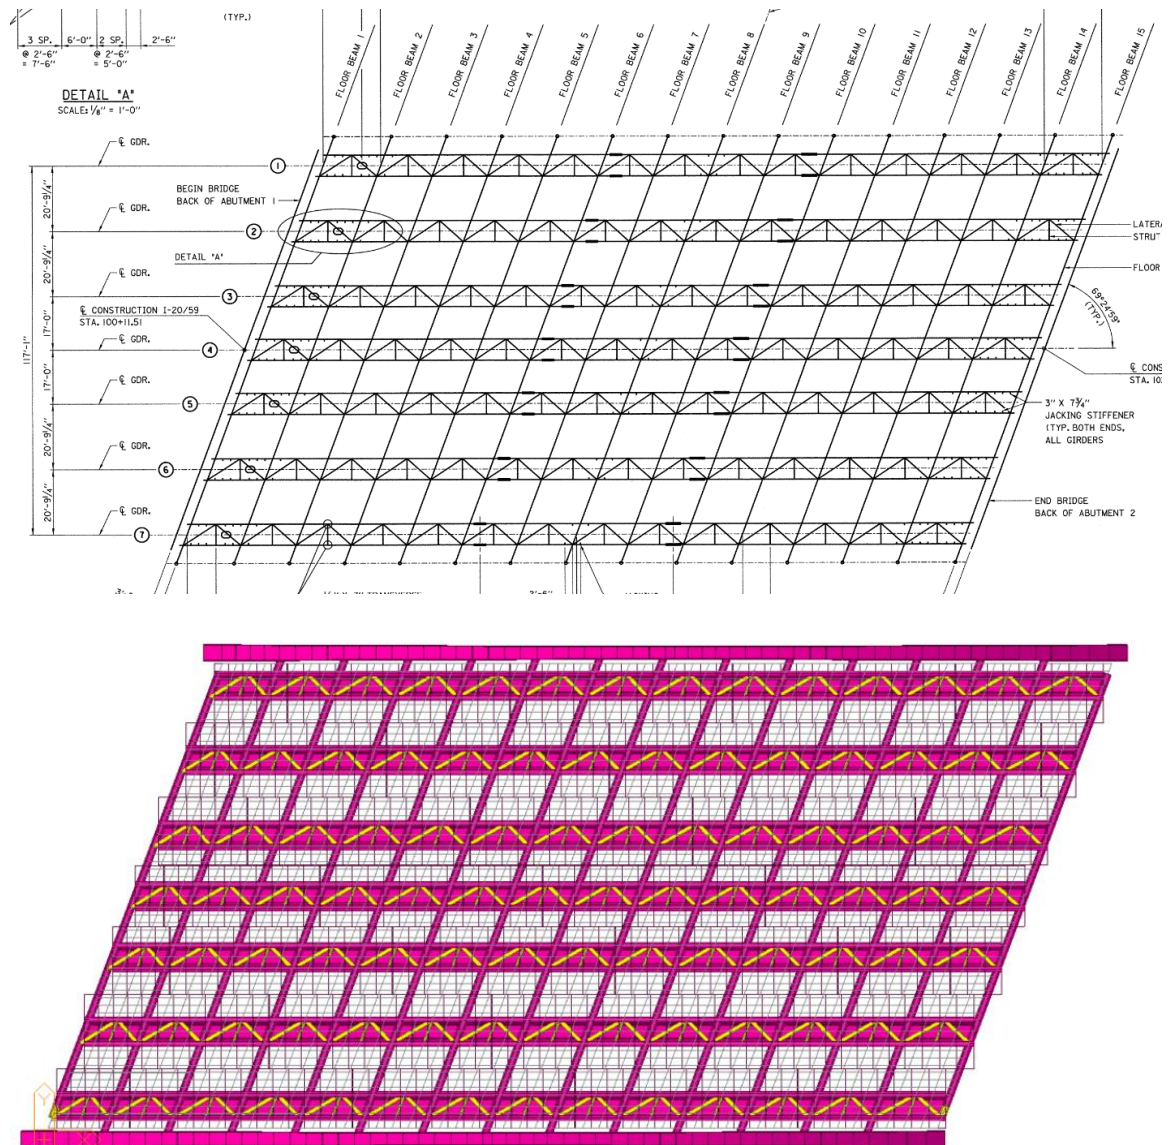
Plan view of the floorbeam: technical drawing (top) and FE model (bottom) – Arch_2
